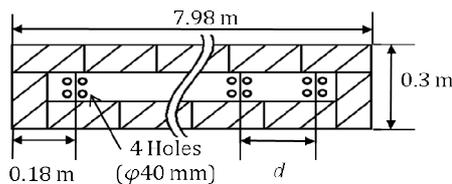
Double wythes clay brick masonry wall with grouted cavity (not to scale).
